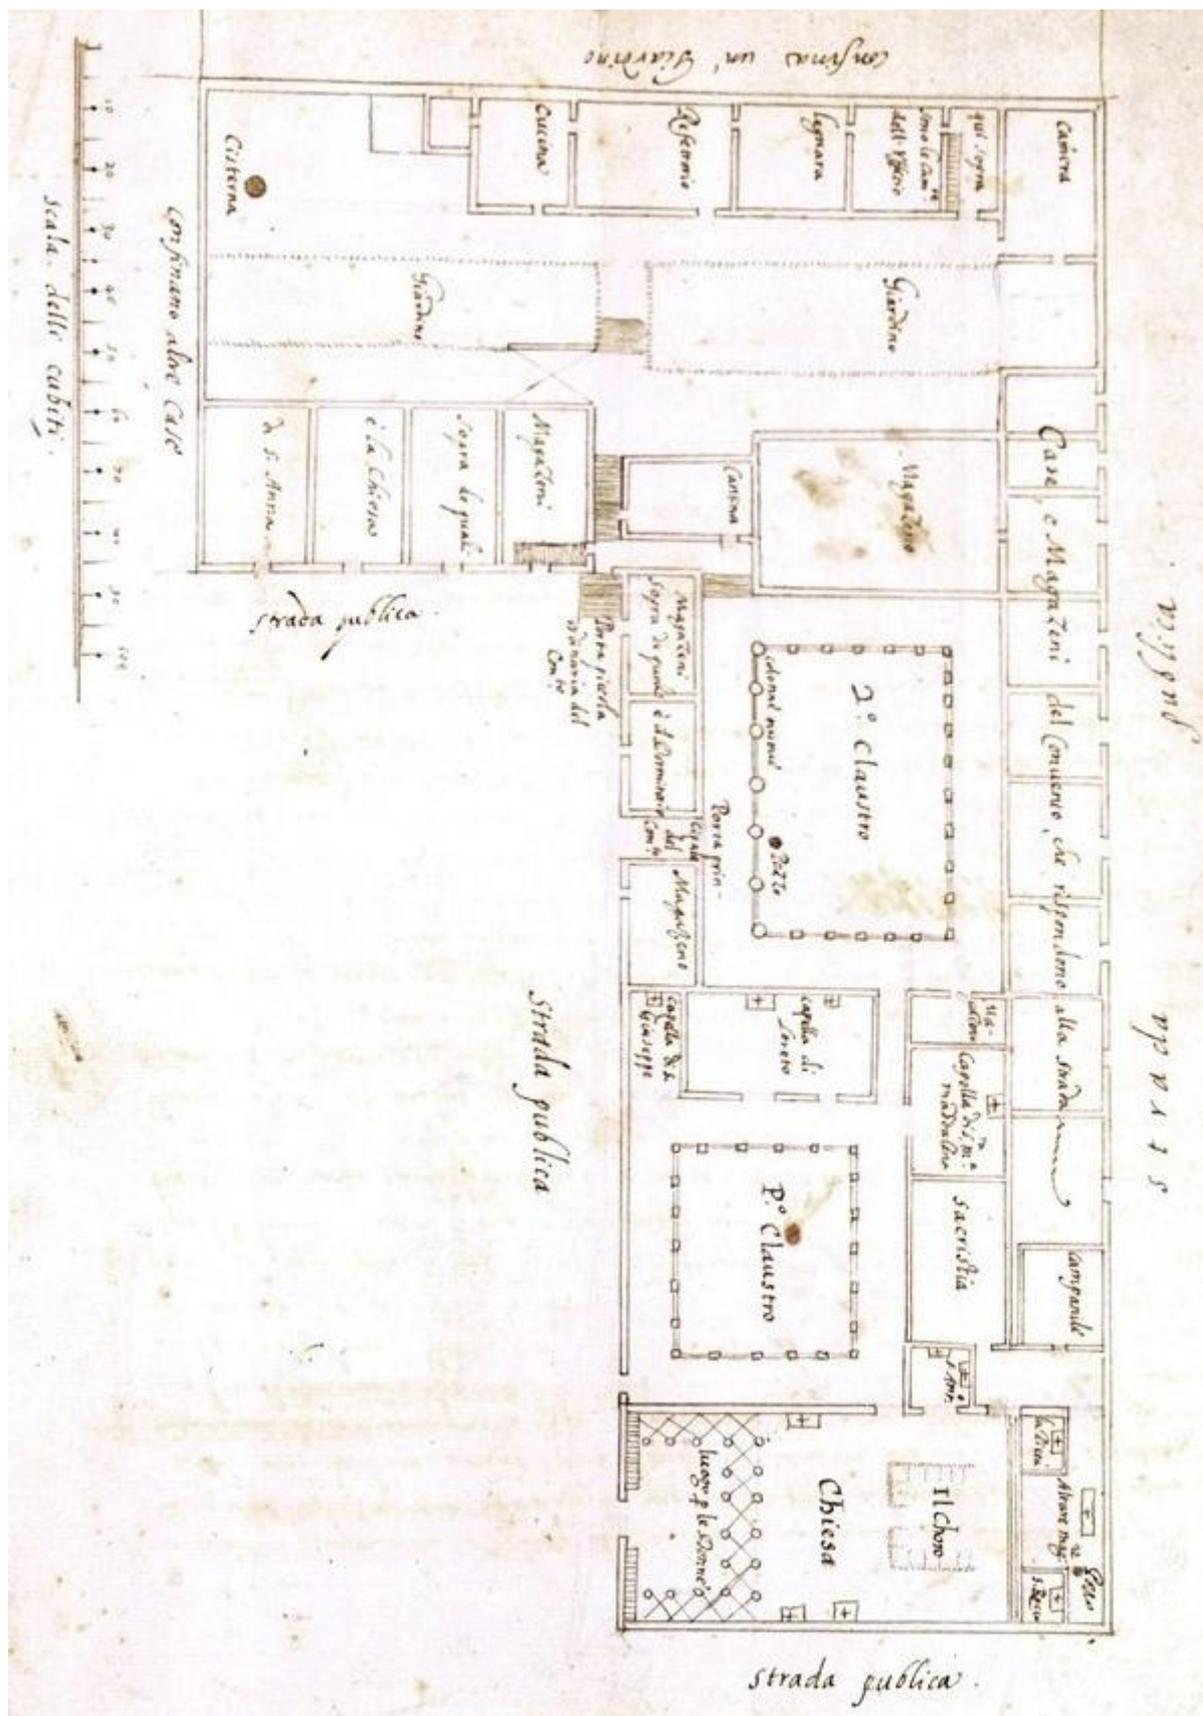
Floor plans of the buildings inside the Franciscan convent as of 1639 (Archivio Storico “De Propaganda Fide”, SOCG Vol. 163, p. 263 v., 1639) (1 Cubit = ~ 0.45 m)
